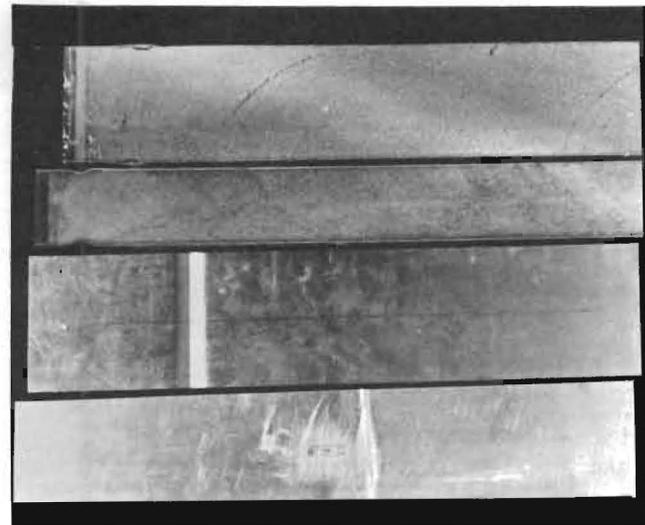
SANDWICH BEAMS AND PANELS IN FACE DIMPLING MODE
